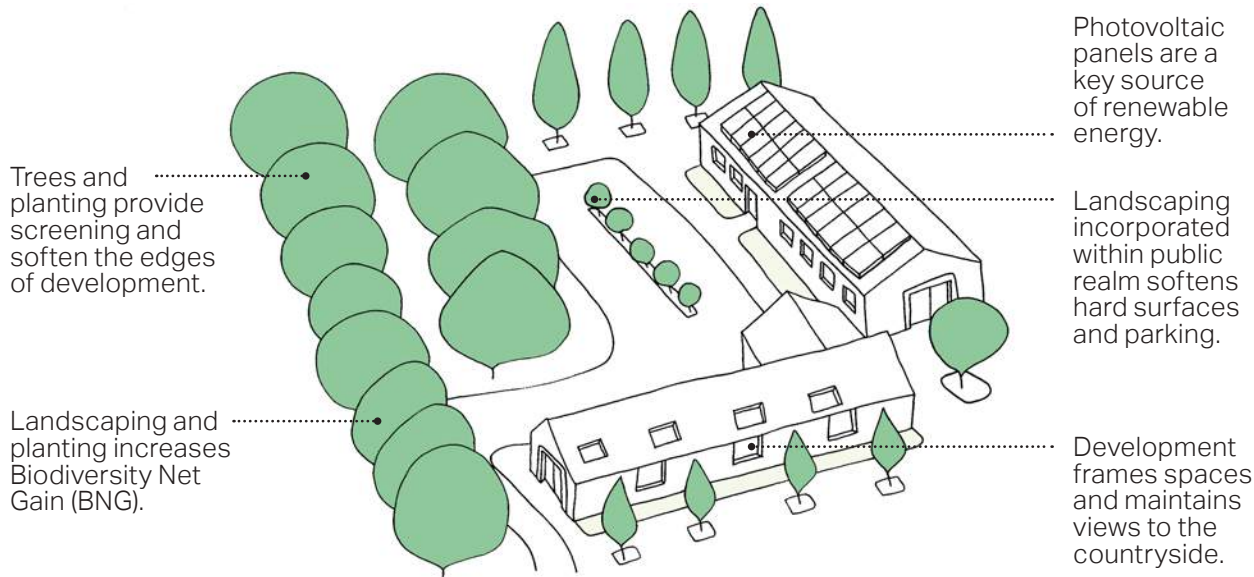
Proposals should be positioned behind natural screening and utilise renewable energy sources such as solar.
